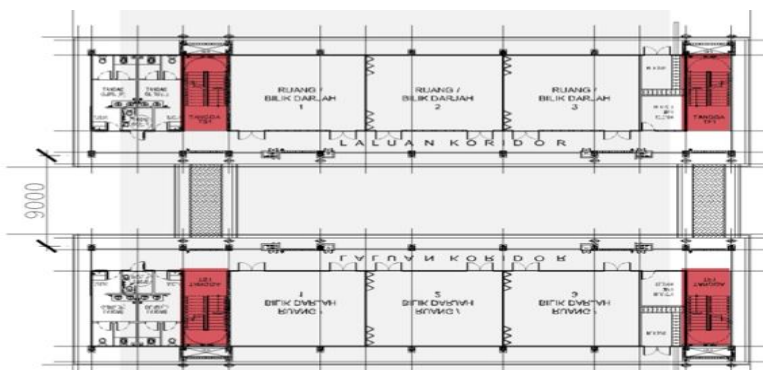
Two school buildings connected with parallel walkways (Source: Pre-Approval Plans Flexible School Module, 2022).
